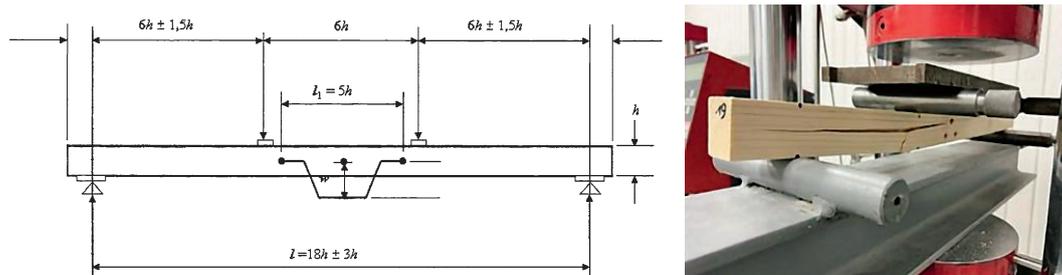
Four-point bending scheme (a) and specimen in testing machine (b); here h – specimen thickness; l – distance between supports
